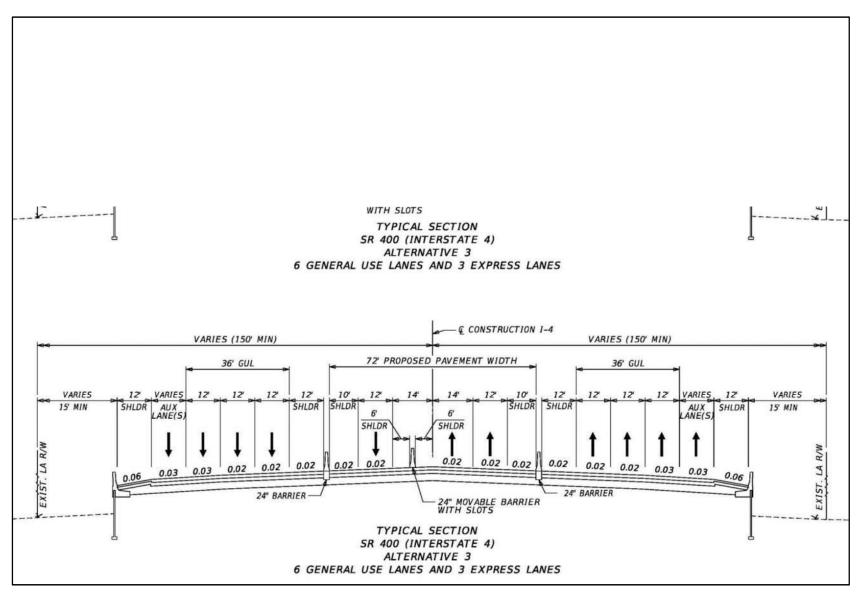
Typical Section – 6 GUL + 3 EL (Zipper Lanes)
